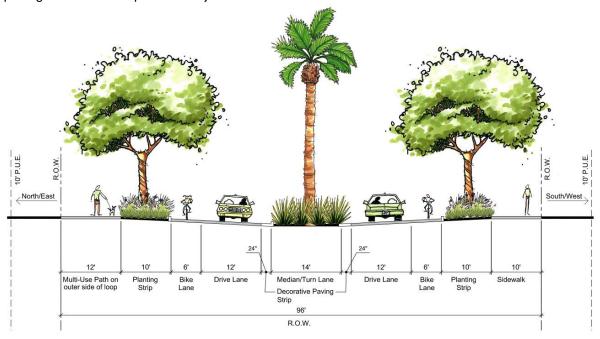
'C' Street - Loop Road - Section - Between Connector Road and
